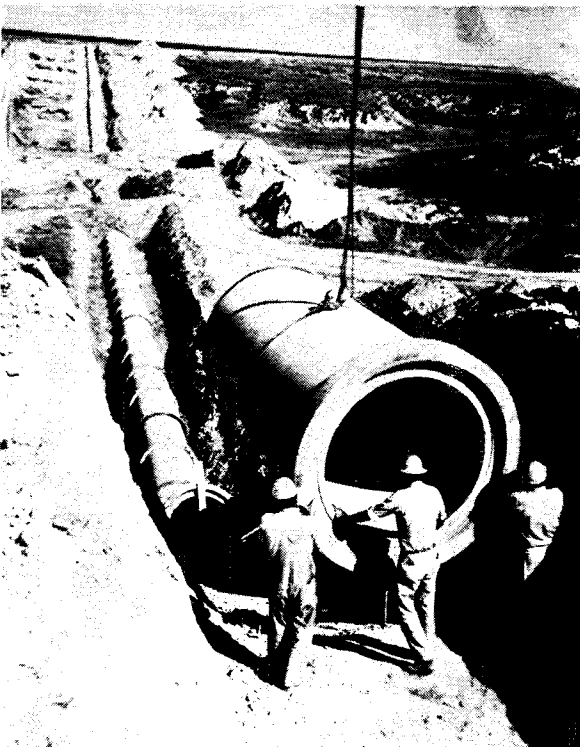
Precast reinforced concrete pressure pipe used for inverted siphon. P-328-701-8498
